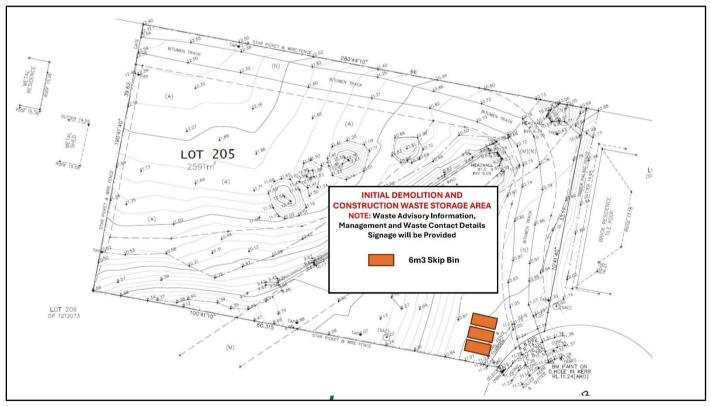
Indicative Initial Demolition and Construction Waste Storage Area
